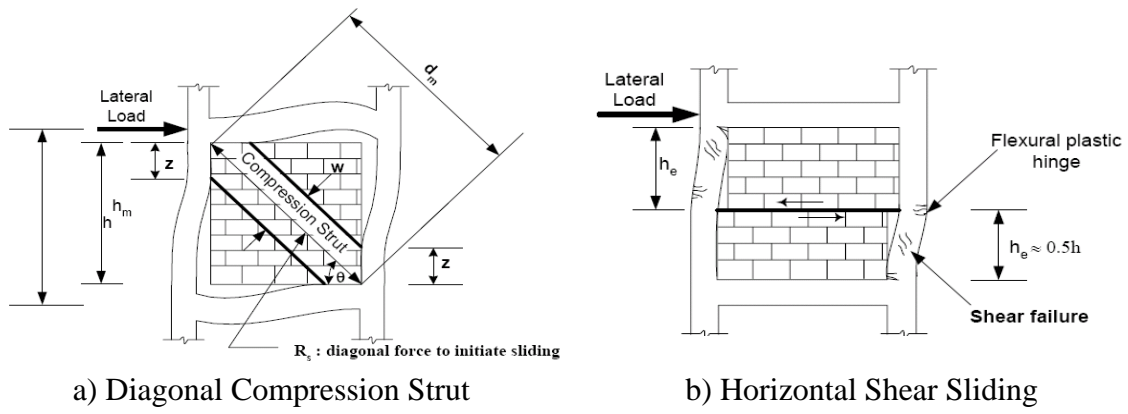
Diagonal Sliding Shear Failure of Masonry Infill
